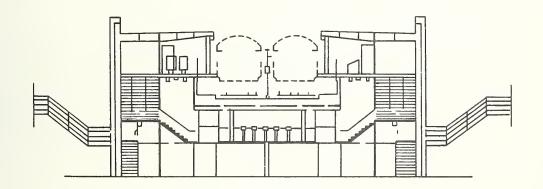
Cross Section of a Side Platform-Above Grade Transit Station (Type 2)
